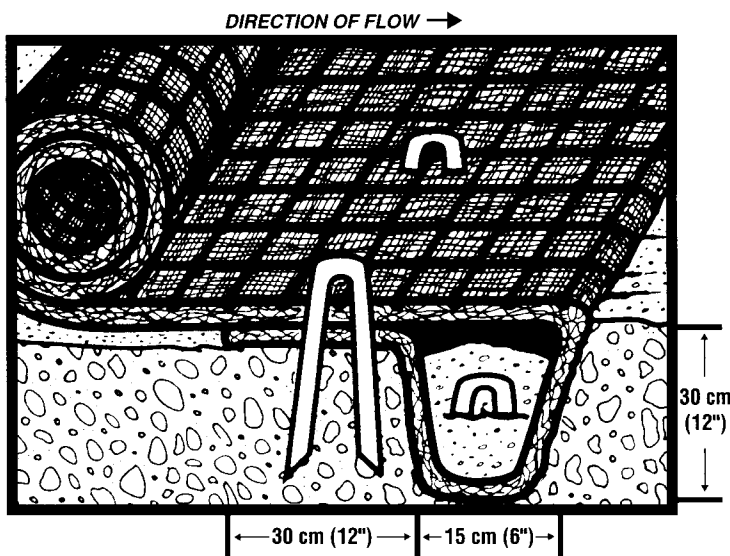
Typical Initial Anchor Trench for Blankets and Mats
